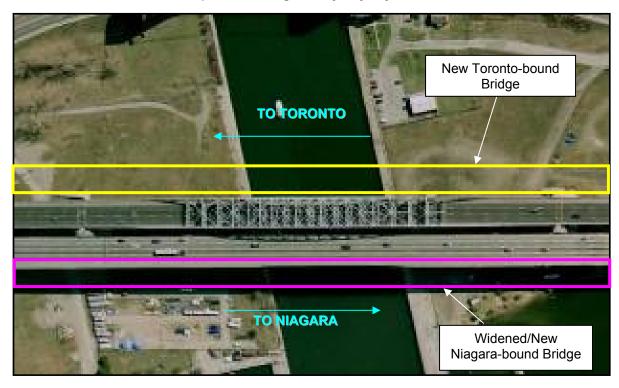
Proposed Burlington Bay Skyway for Alternative 3-1
